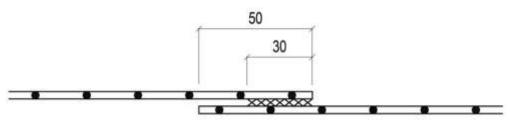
A single-track hot-air weld made with a manual welding machine
